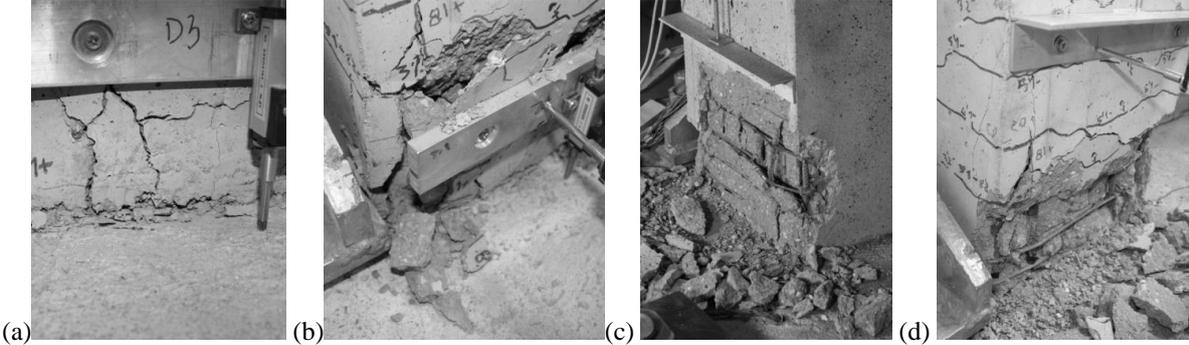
(a) The damage of the concrete cover was initiated at 2 % drift, (b) Concrete cover spalled at 3.2 % drift, (c) then the buckling of the longitudinal bars occurred, first at the side where the lateral bars were overlapped, (d) then on the opposite side
